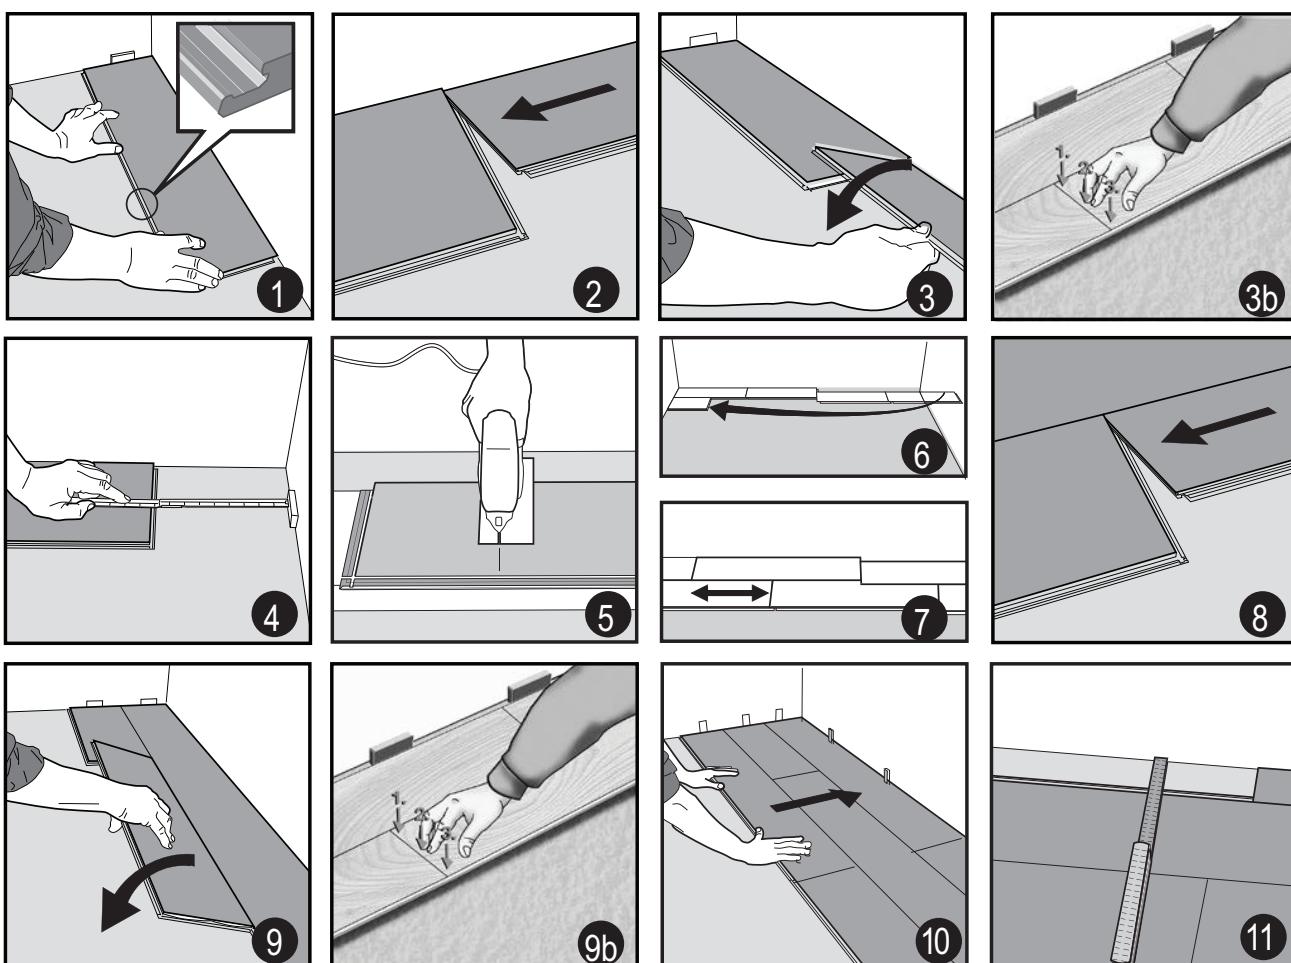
Mark and cut the last board with a jig saw, placing the board face down. If using a hand saw, the board should be face up.
